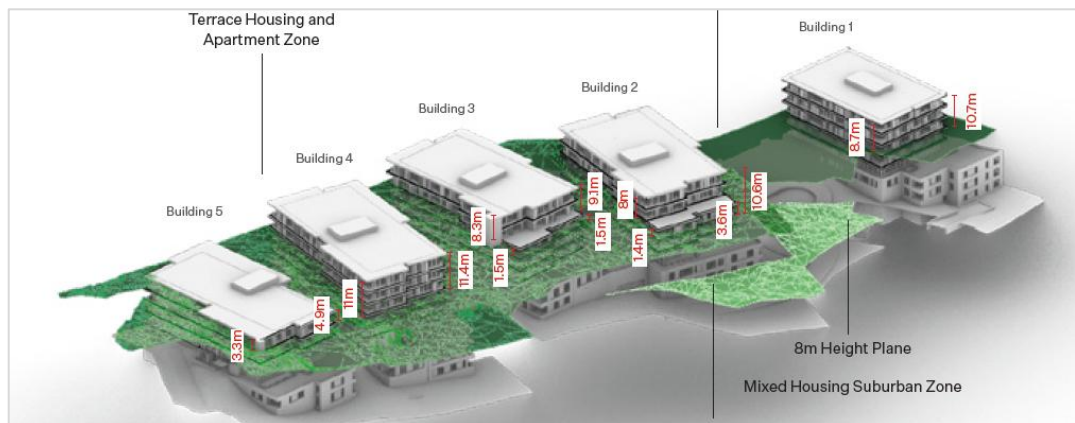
View towards the Site the from the south (Source: Sheet 34 of Attachment 18).
